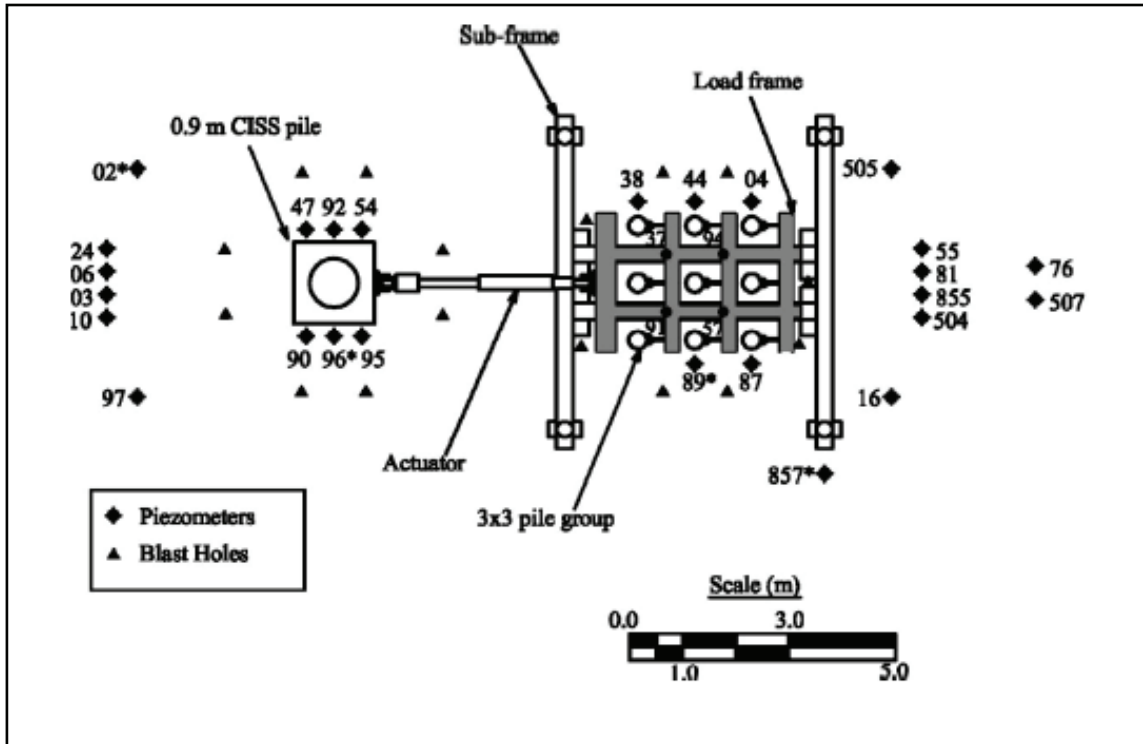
Plan view of test site layout during load test at 3x3 pile group location, Treasure Island Test (Rollins et al.,2005)
